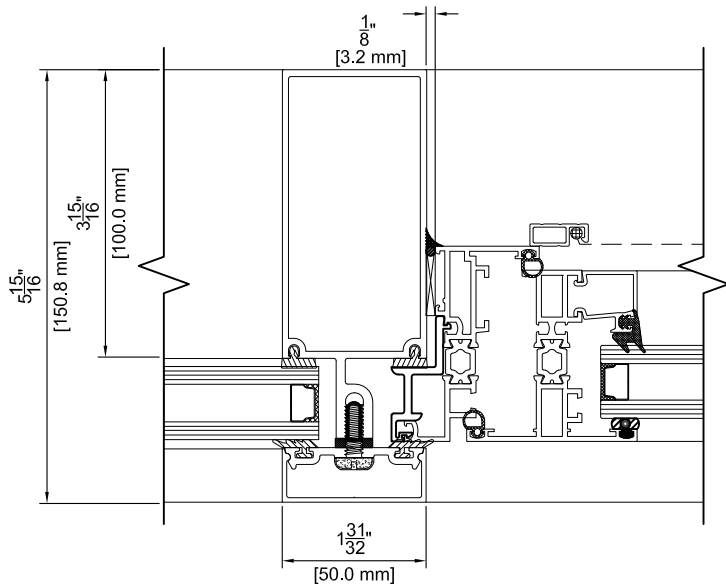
DETAILS SHOWING ULTRAVENT WINDOW INSTALLED INTO VERSAWALL MIDLINE CURTAIN WALL. SEE THE WINDOWS SECTION FOR FURTHER INFORMATION ON THE ULTRAVENT.
